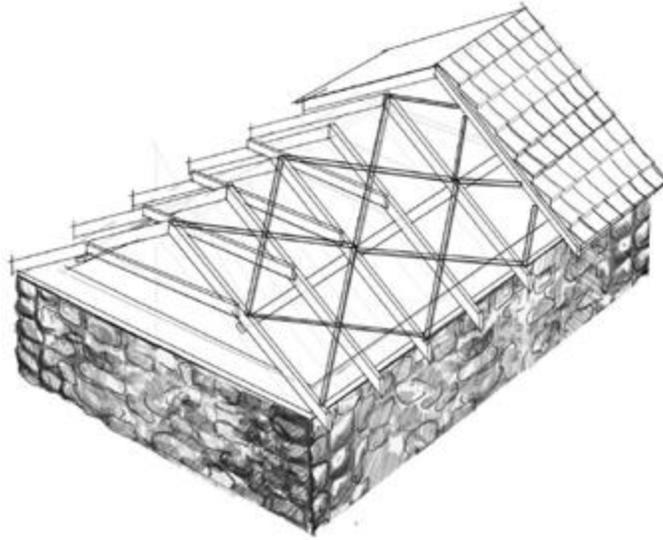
Roof bracing (Bothara & Brzev, 2011)
